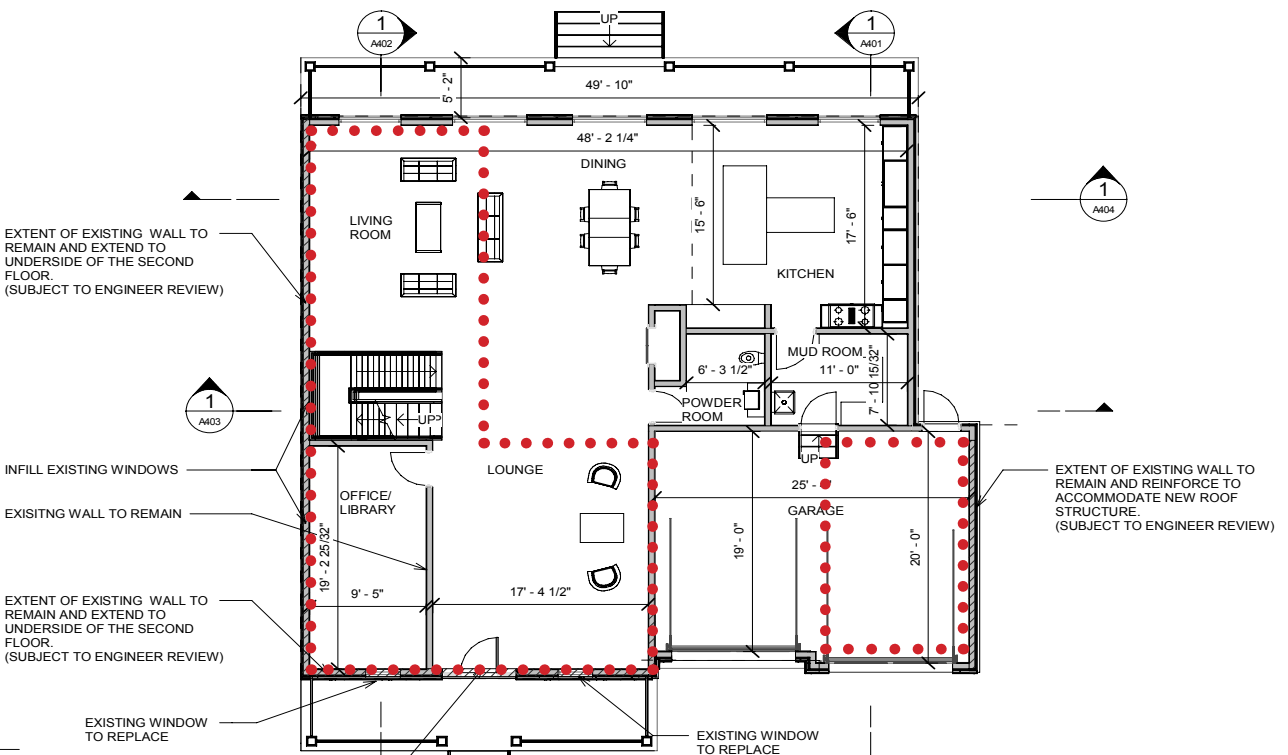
Ground/First Level Floor Plan. Red dotted lines indicate location of original residence (footprint) to be incorporated into proposed addition/renovation. Drawing by Third Layer Architects, 2021.
